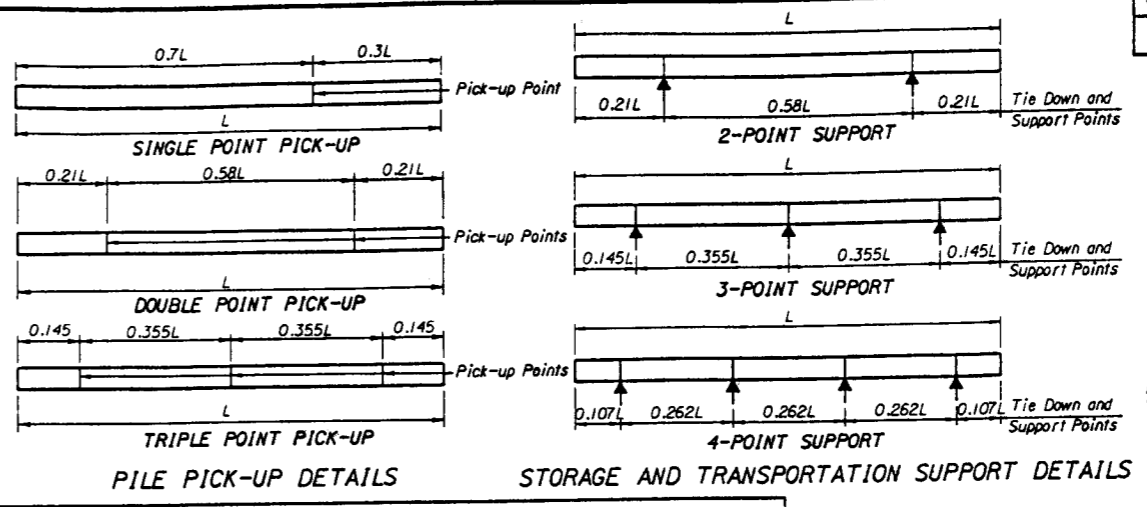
" X 18" PRESTRESSED CONCRETE PILE
